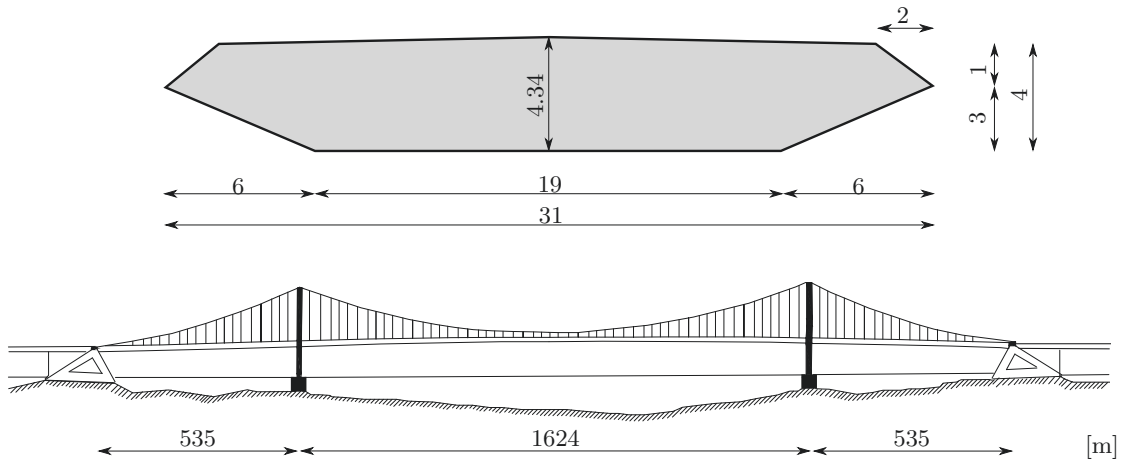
Great Belt Bridge: deck cross-section (top) and structural system in elevation (bottom).
